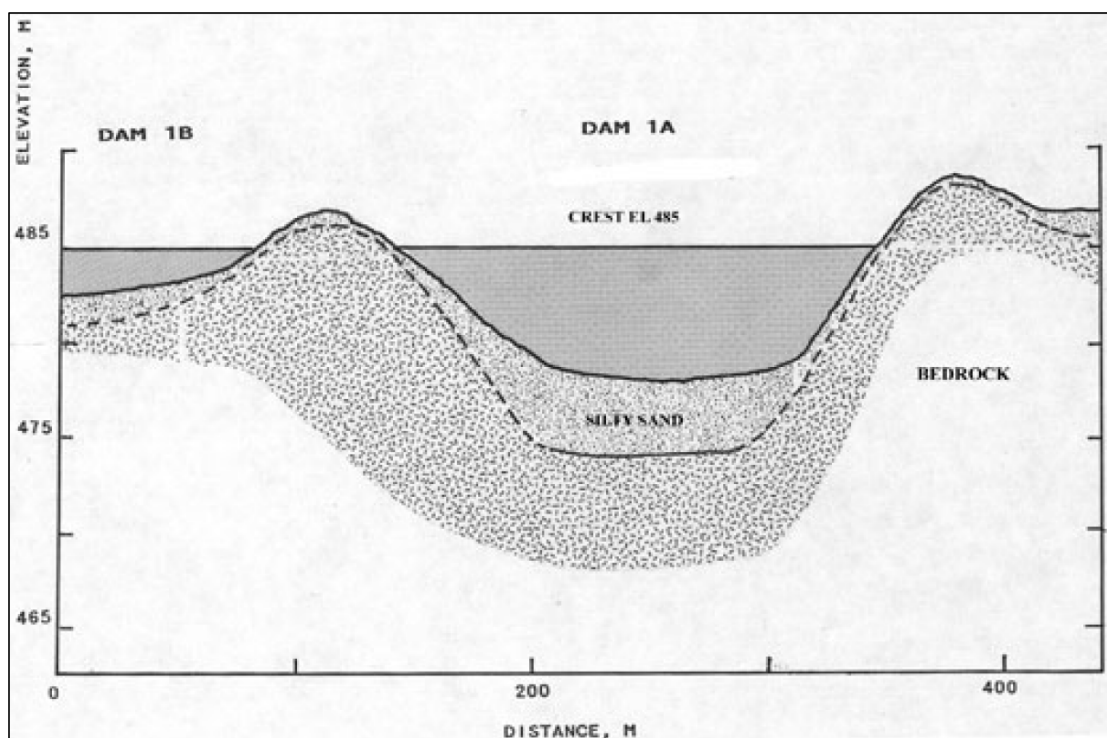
Dam 1A Foundation Profile (after Holubec 2004)
